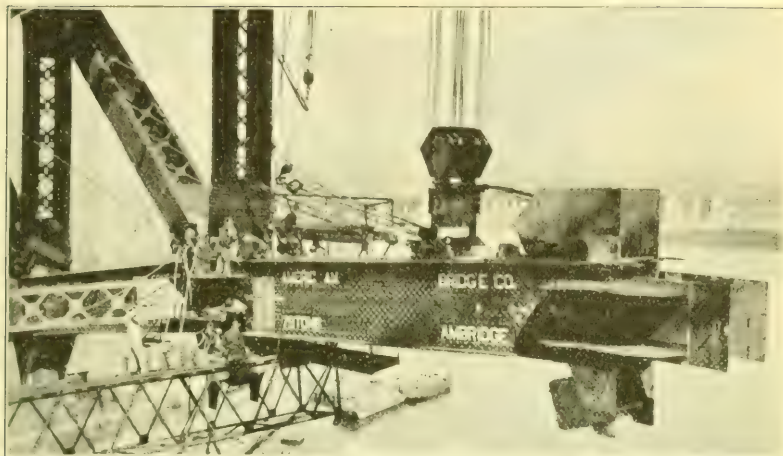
CONNECTING BOTTOM CHORD MEMBER, HELL GATE BRIDGE.
